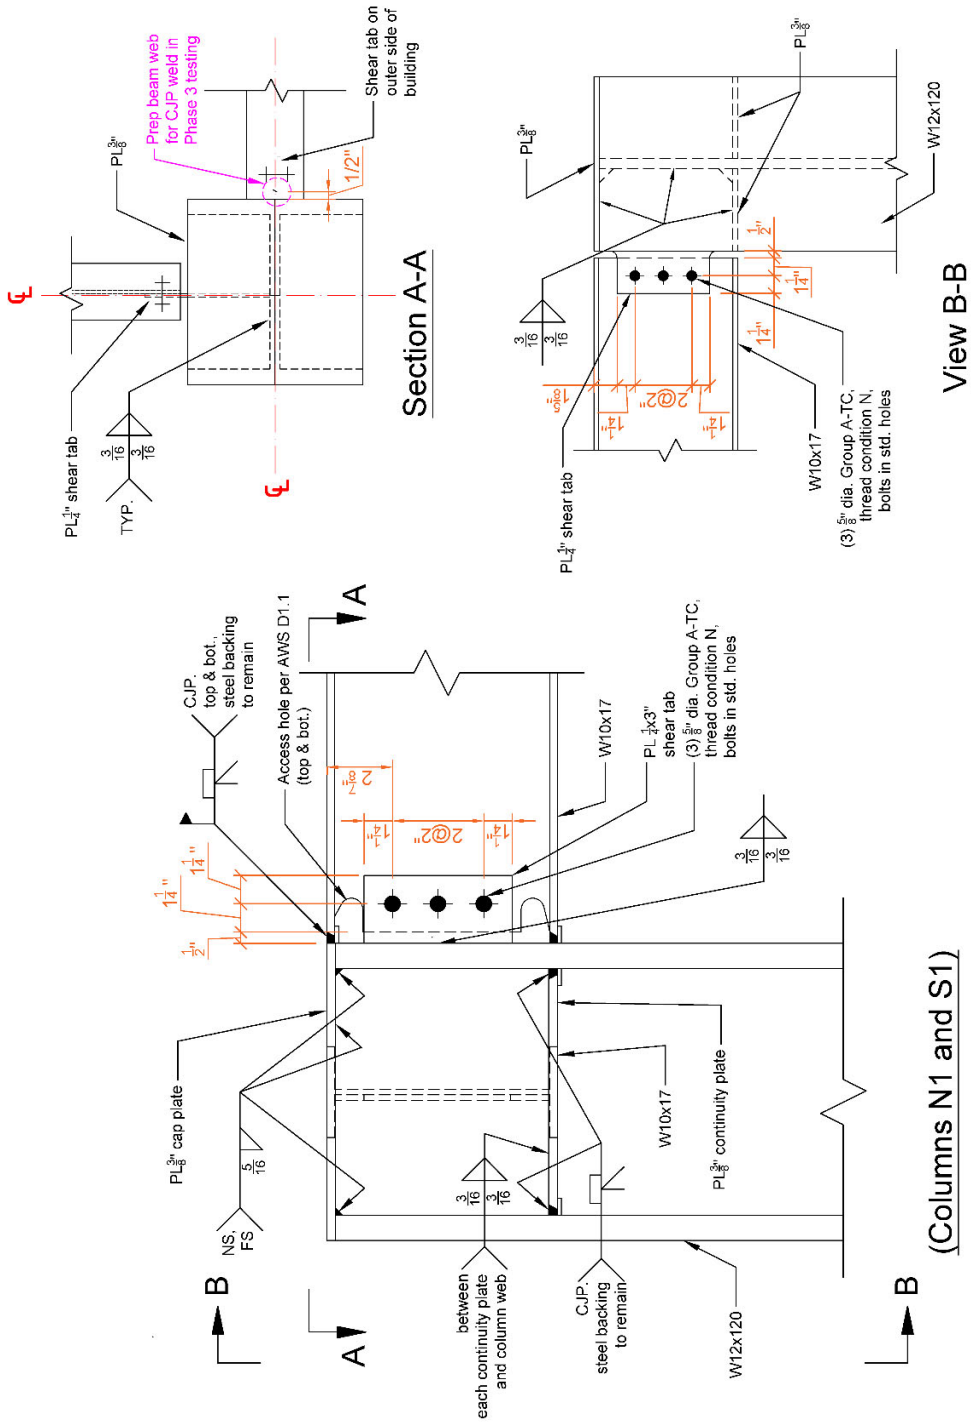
All Flange Weld (AFW) Collector-to-Column Connection (DWG NS09)
